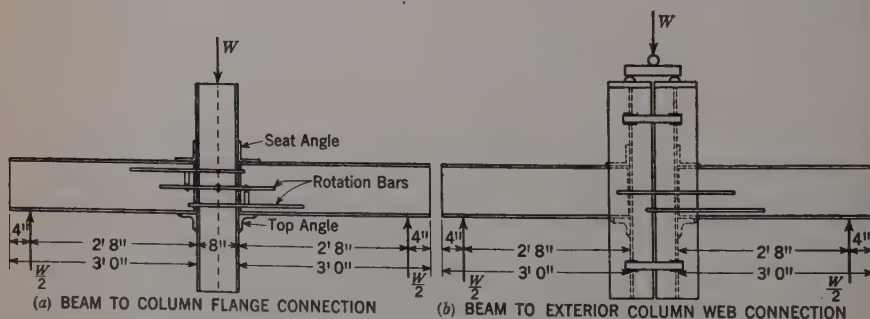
TEST ARRANGEMENT TO DETERMINE CONNECTION CONSTANTS
